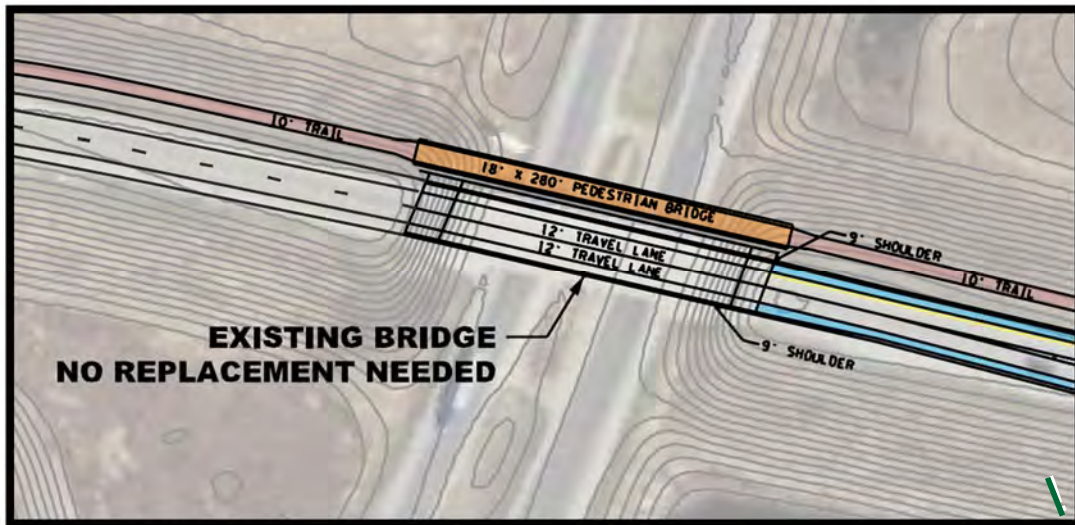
CSAH 61/Highway 212 Pedestrian Bridge.
